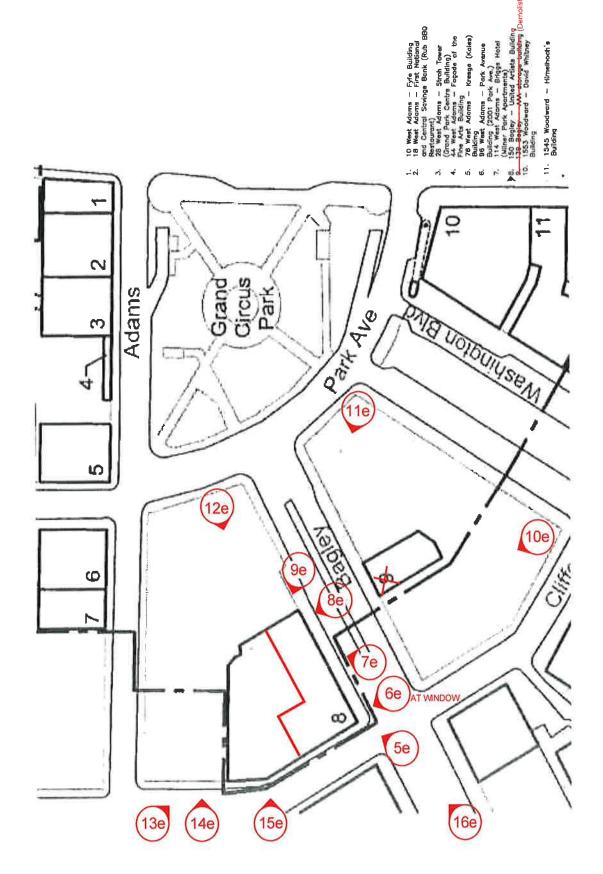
PHOTO KEY PLAN ENLARGED SITE PLAN A NO SCALE
